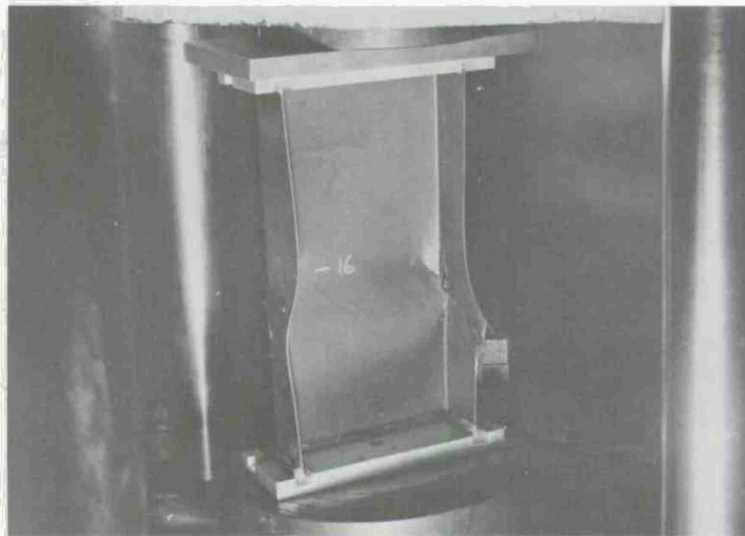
Ultimate compressive failure of channel specimen 16-3 at 9,325-lb load.
